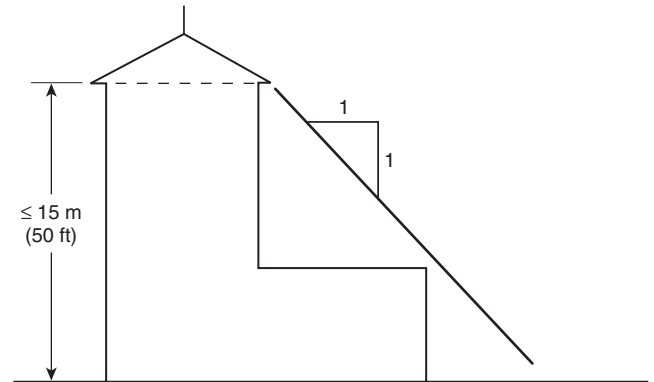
(b) Lower Roof Protection Provided by Pitched-Roof Buildings 15 m (50 ft) or Less in Height.
